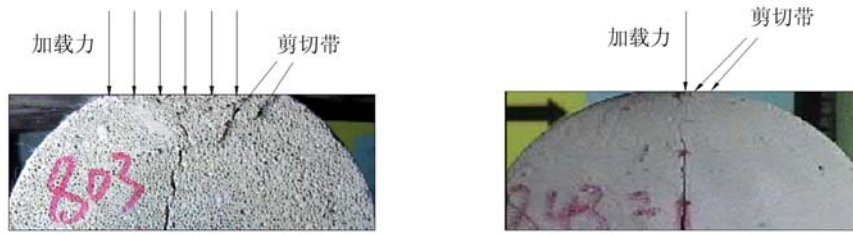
Splitting tensile test of typical foam concrete specimen by the steel strip loading
